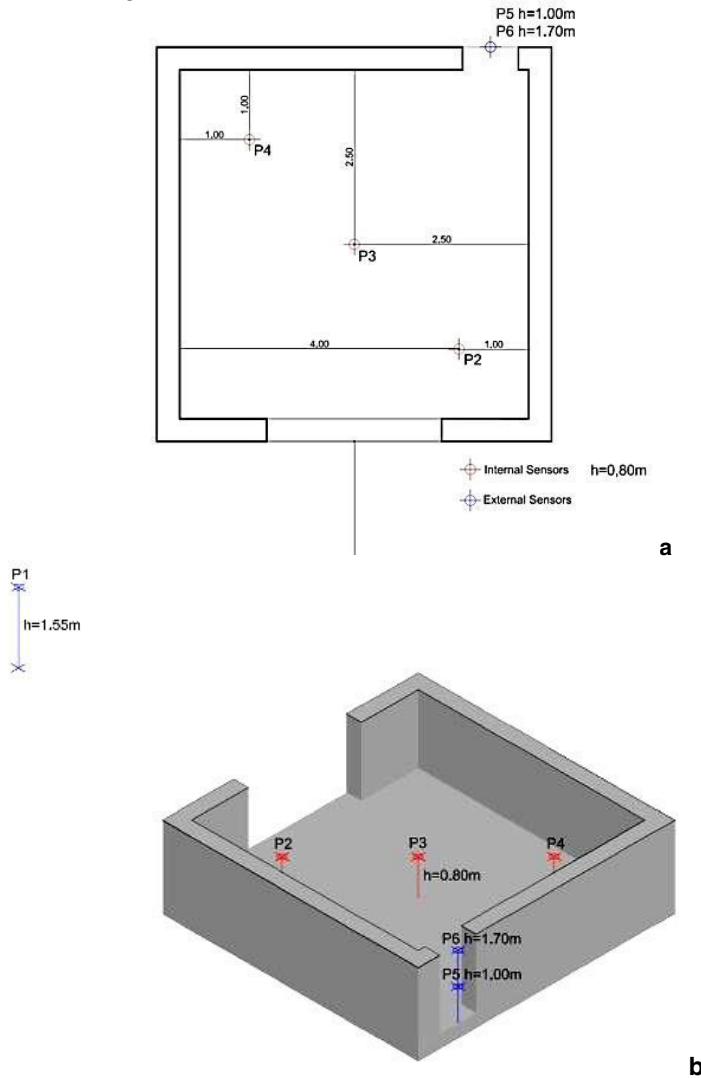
Positioning of the sensors inside the model. Floor plan (a) and perspective (b).
